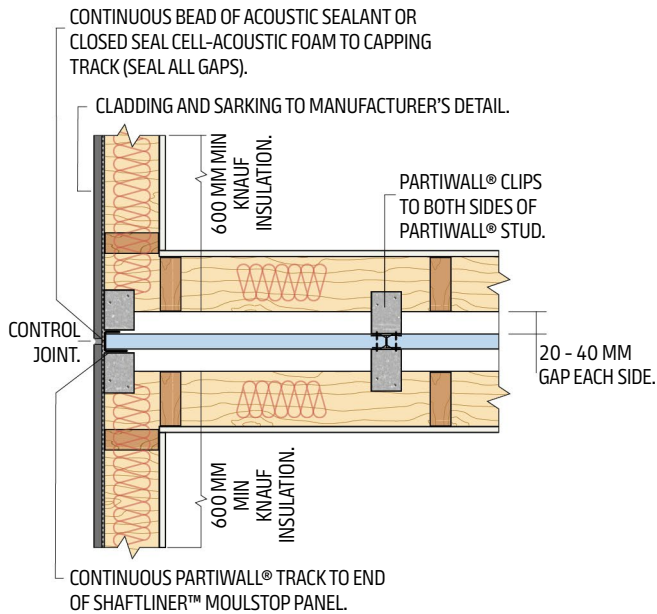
Clad Wall Junction with Thermal Break – Plan View
